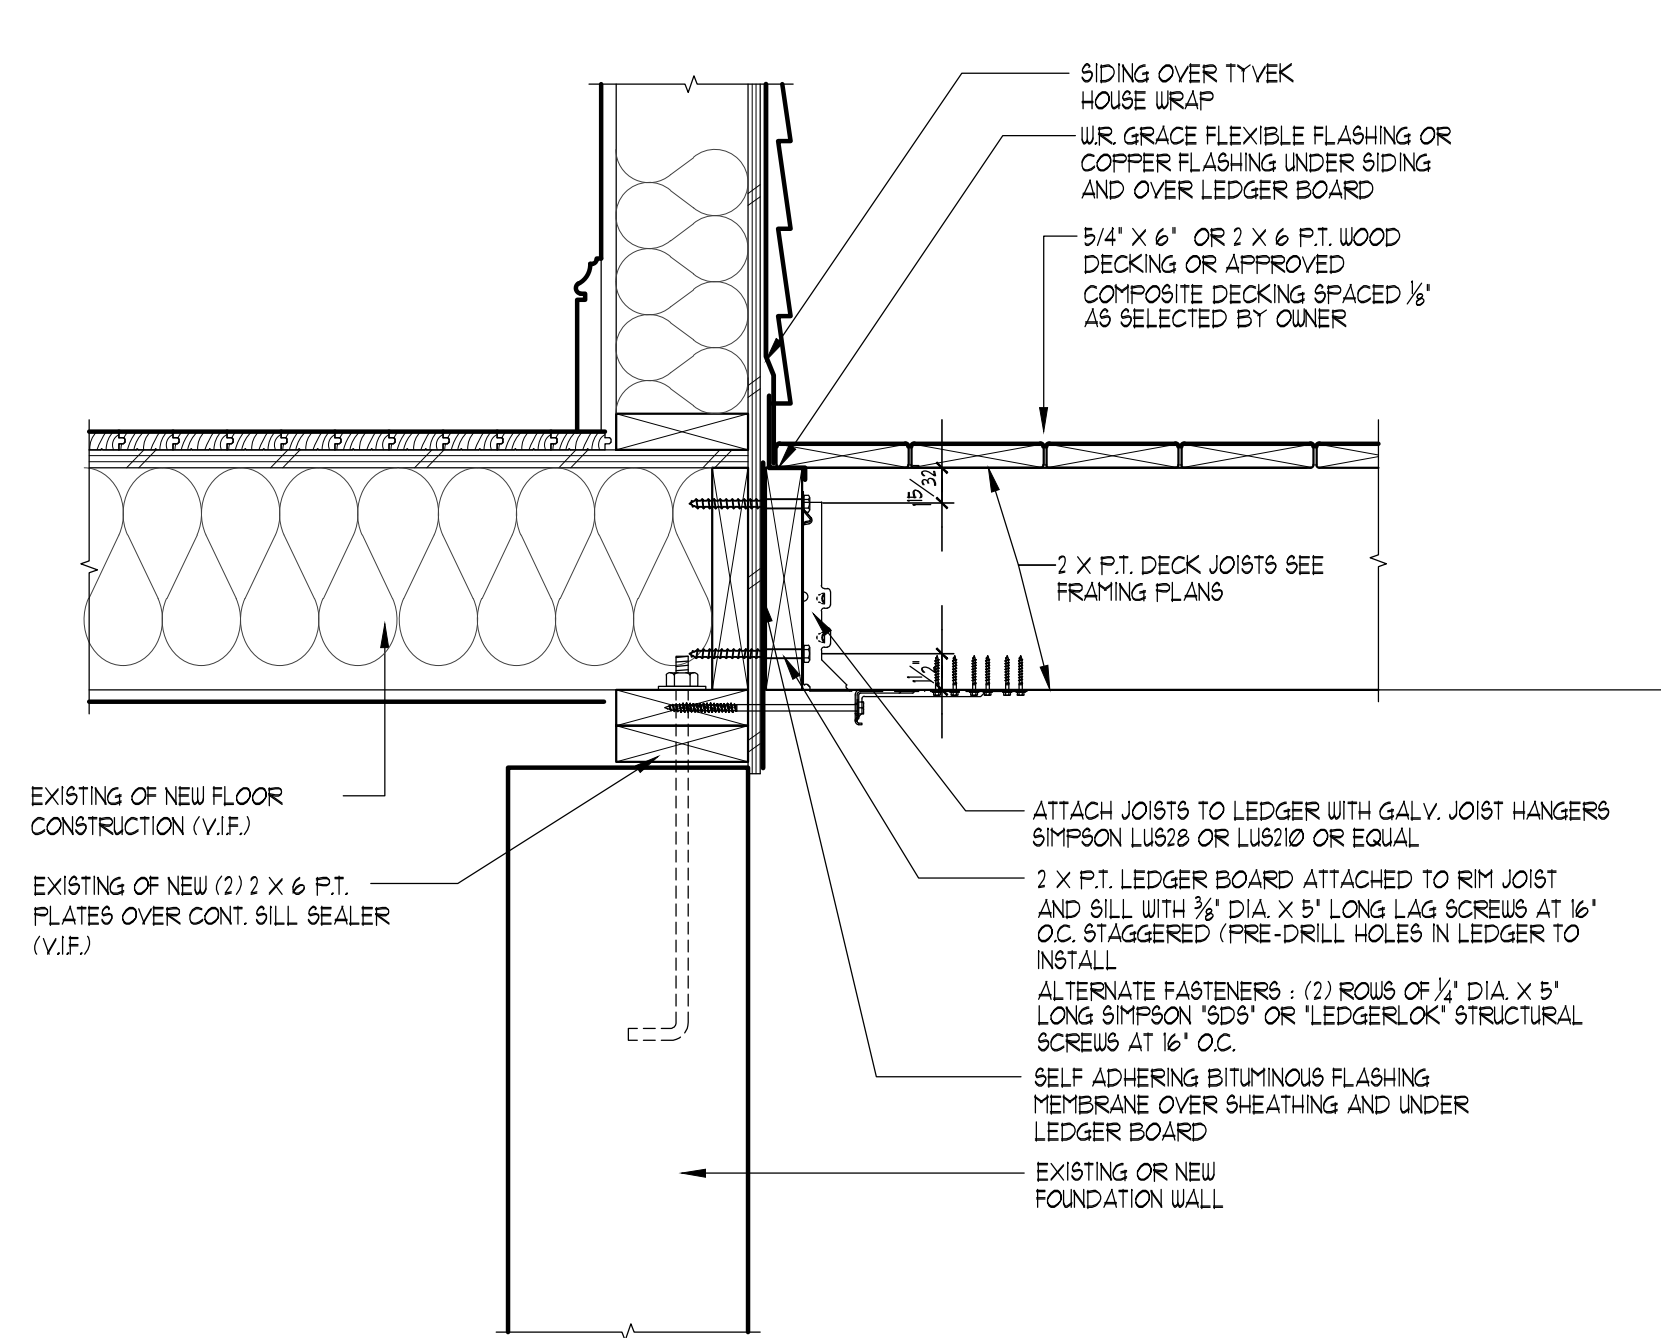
\"/> SCALE: 3/4" = 1'-0"
